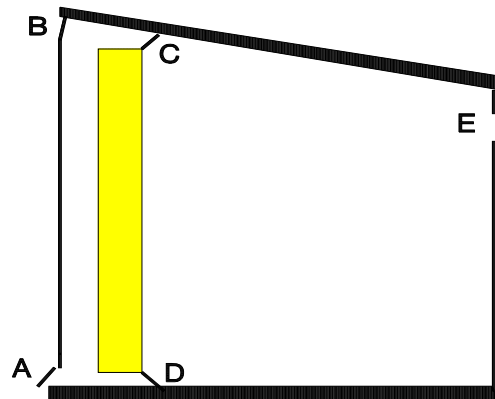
A Trombe wall house of the design used in Bebbington scheme.
